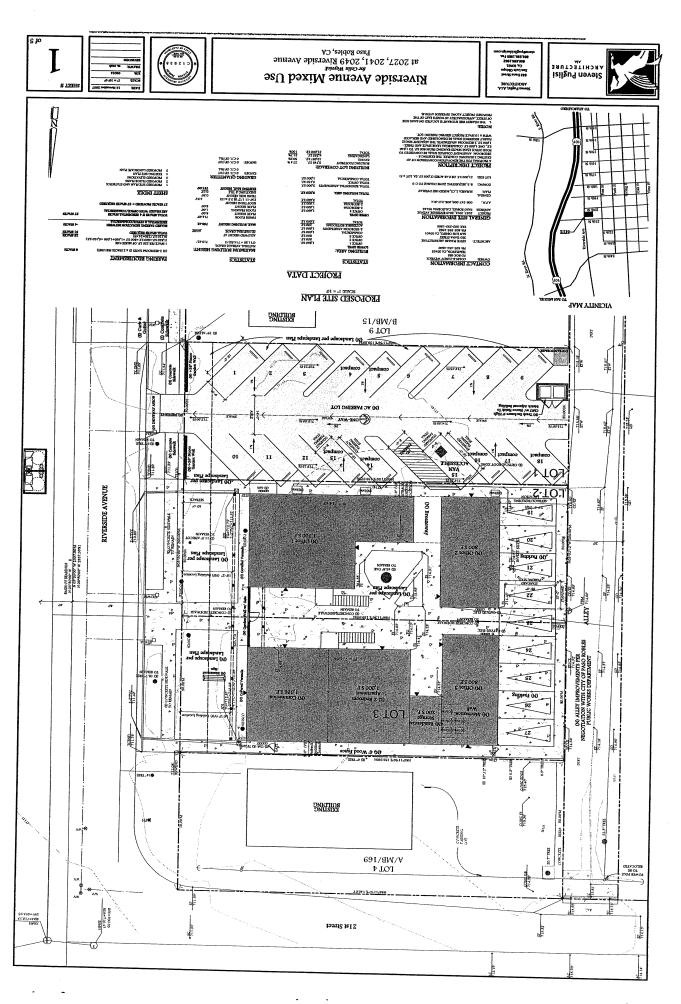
Exhibit B Site Plan / Statistics PD 07-010 (Weyrick)
